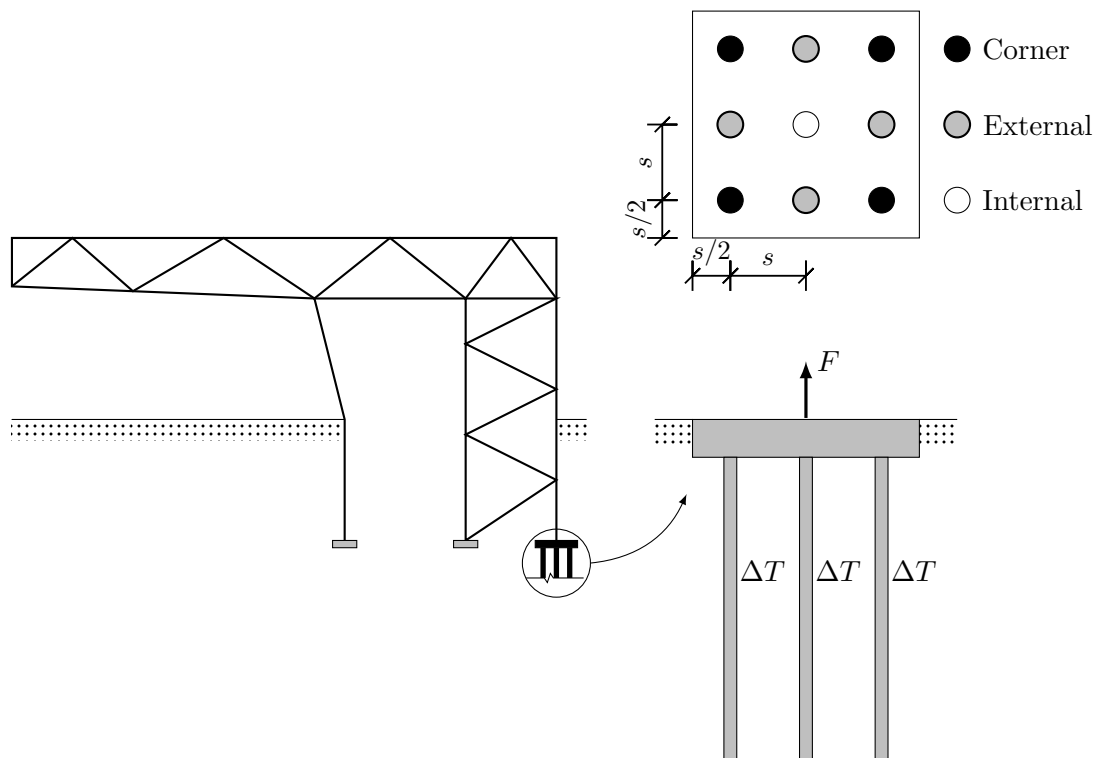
Scheme of a steel frame with piled raft foundation, view of foundation with piles position, and zoom of piled raft with applied loads.
